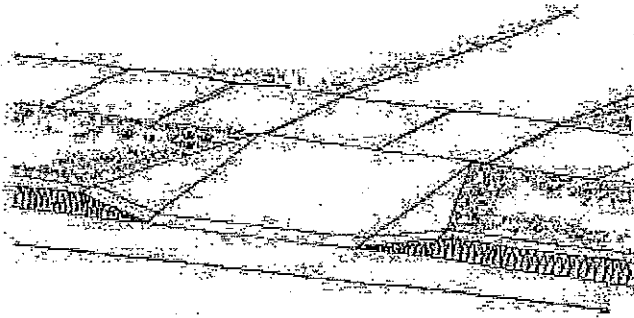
When sidewalks have a planter strip, the ramp of the driveway does not interfere with a pedestrian's path of travel.
